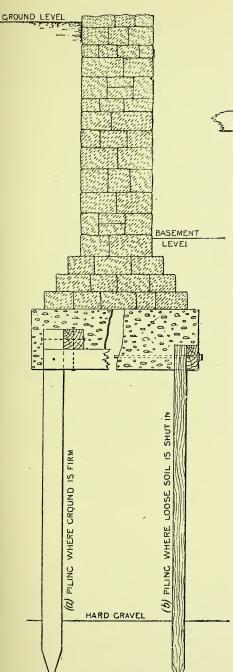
Pile Foundation in Running Sand to carry Lofty Wall.
